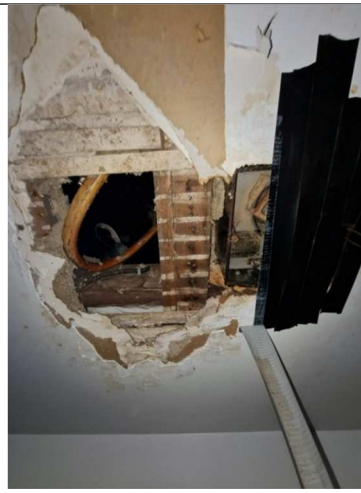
Hole in ceiling. Showing signs of water damage.
